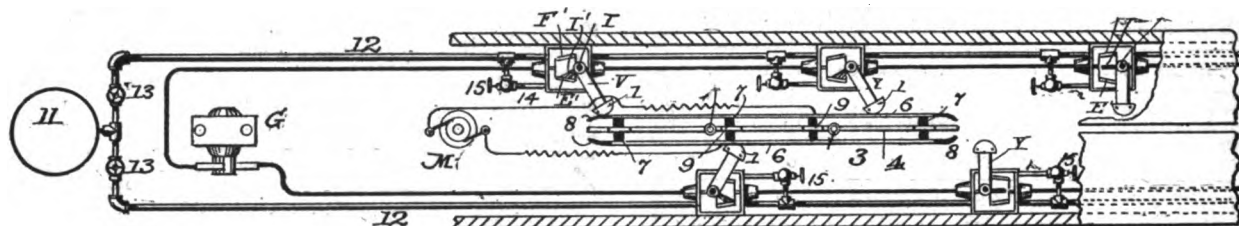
UNDERGROUND CONDUIT RAILWAY SYSTEM OF THE UNIVERSAL ELECTRIC CO.
